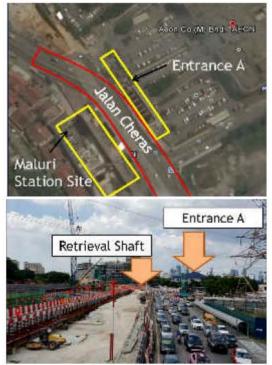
Overview of The Proposed Pipe Roofing System at Maluri Station
